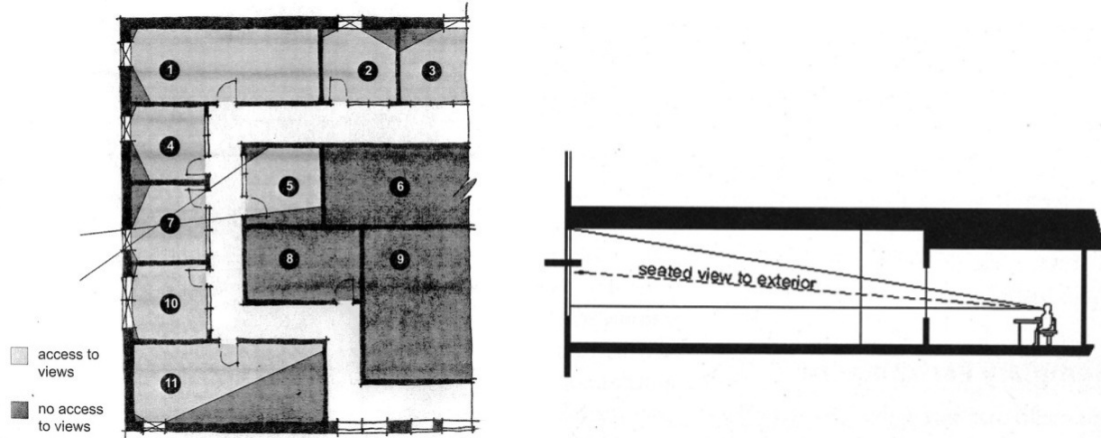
Drawing sightlines on plan (left) and section (right) to determine view to vision window. (USGBC, 2005)
